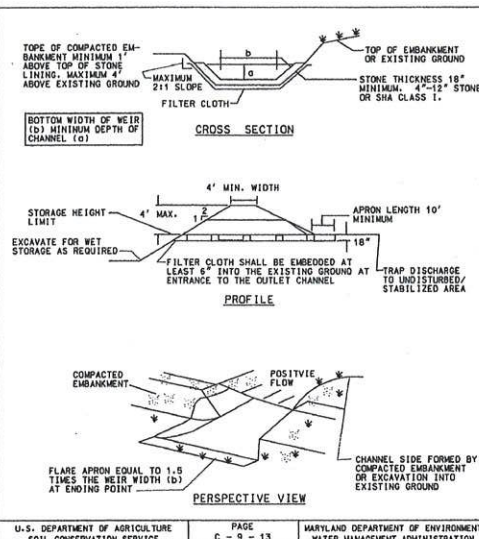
A - STONE/RIP-RAP OUTLET SEDIMENT TRAP - ST IV
